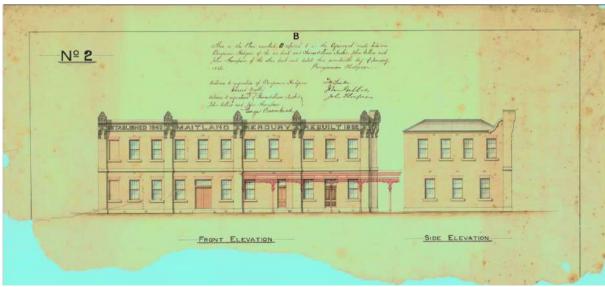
Plan of Alterations and Additions to the Maitland Mercury Office
